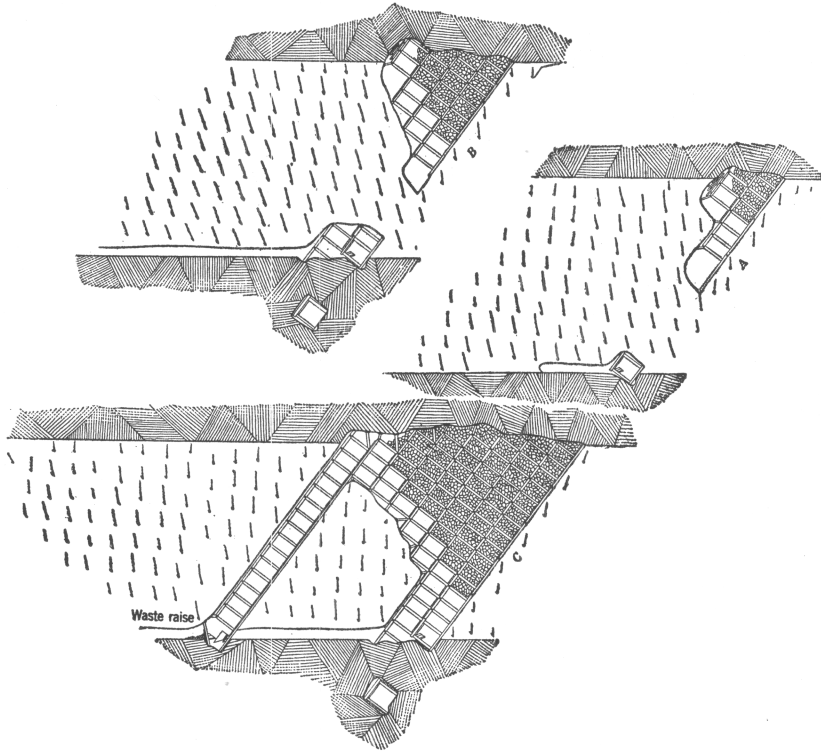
Sections showing stages in square-set stoping, Bunker Hill & Sullivan mine: *A*, Stoping begun and footwall raise started; *B*, stope advancing toward footwall, raise completed, and main haulage drift advancing under footwall (note steep face of stope); *C*, sill floor completely developed and top of stope connected to waste raise.
